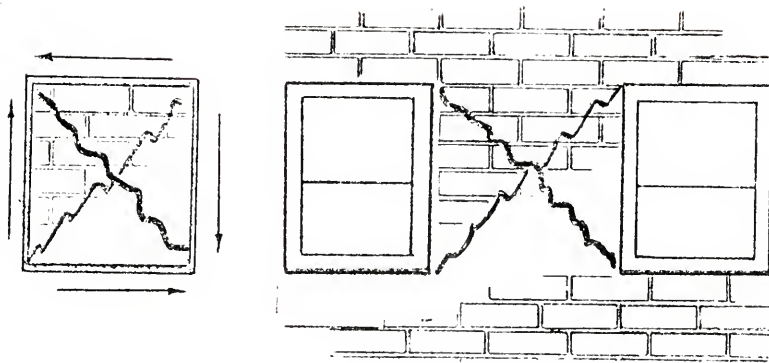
Typical X-cracks in a wall damaged by an earthquake.
